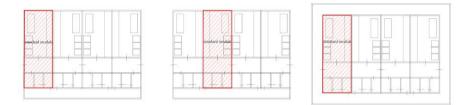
Standard unit layout: Two exterior walls (left); An outer wall (center); Four interior walls (right).
